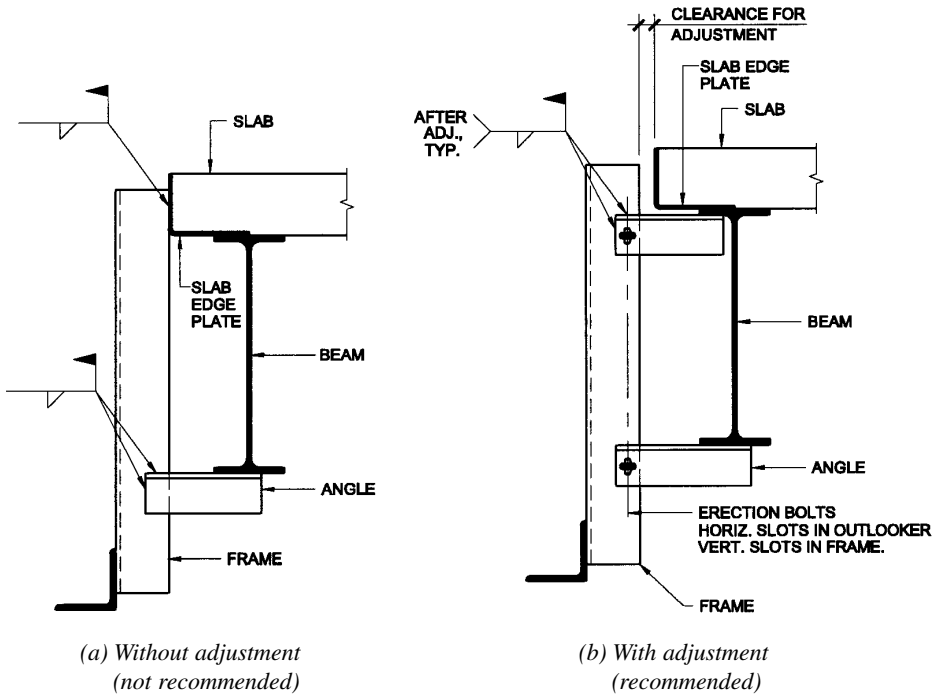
Attaching masonry façade systems to structural steel framing.
